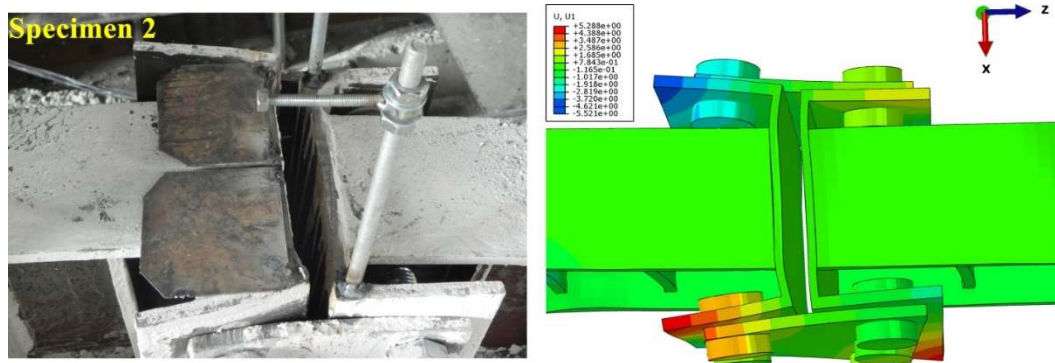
Deformation of saw cut I-sections (Specimen 2)
